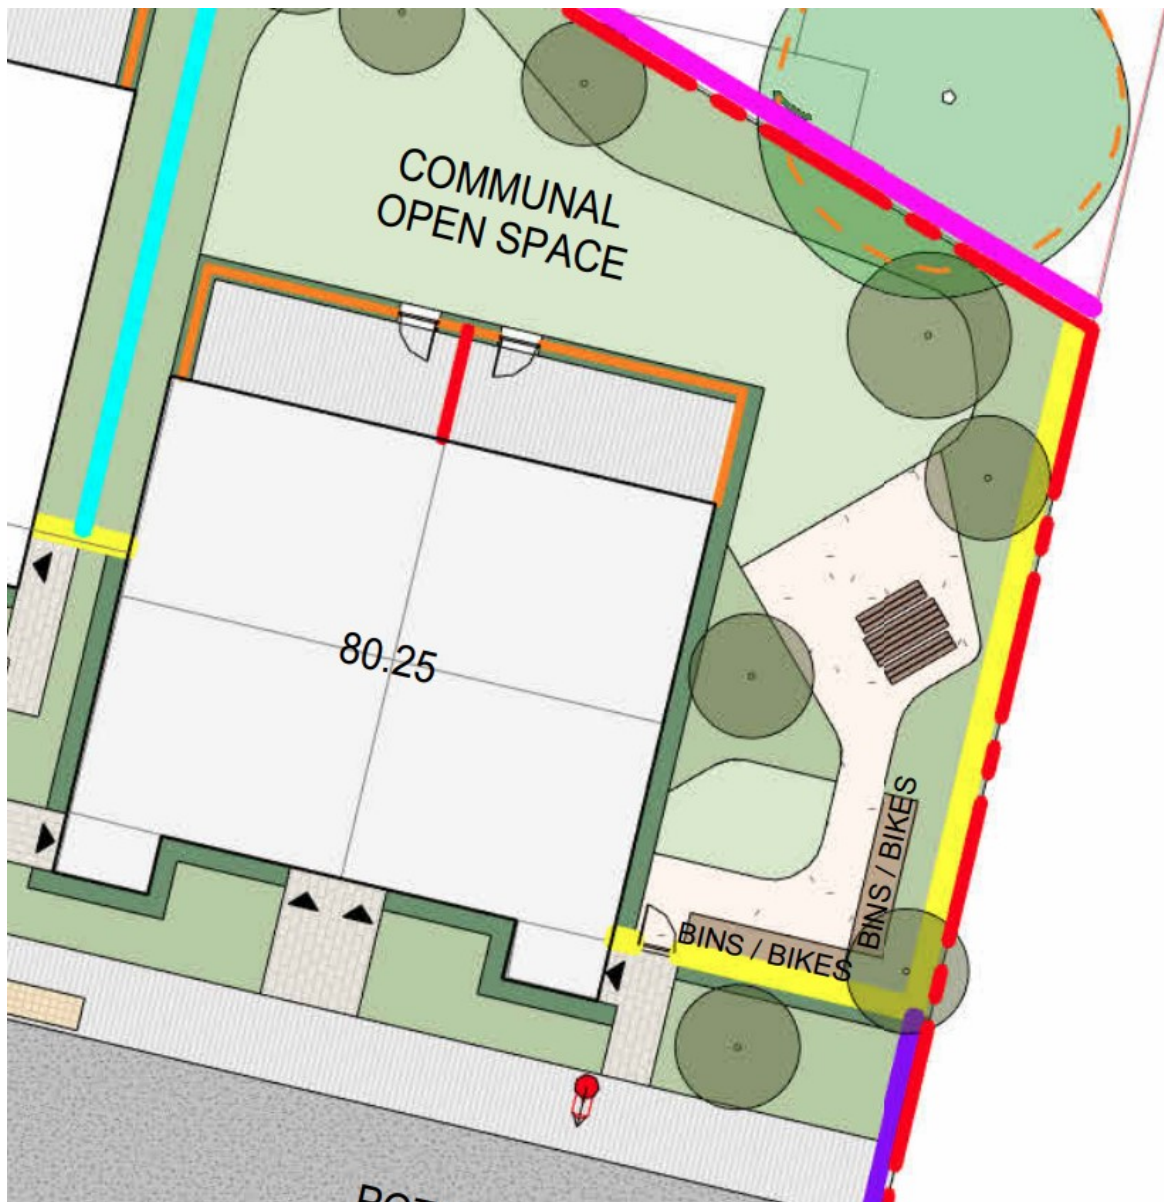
Extract from Architects drawing showing typical mid terrace unit bin storage area (source: JFA)
